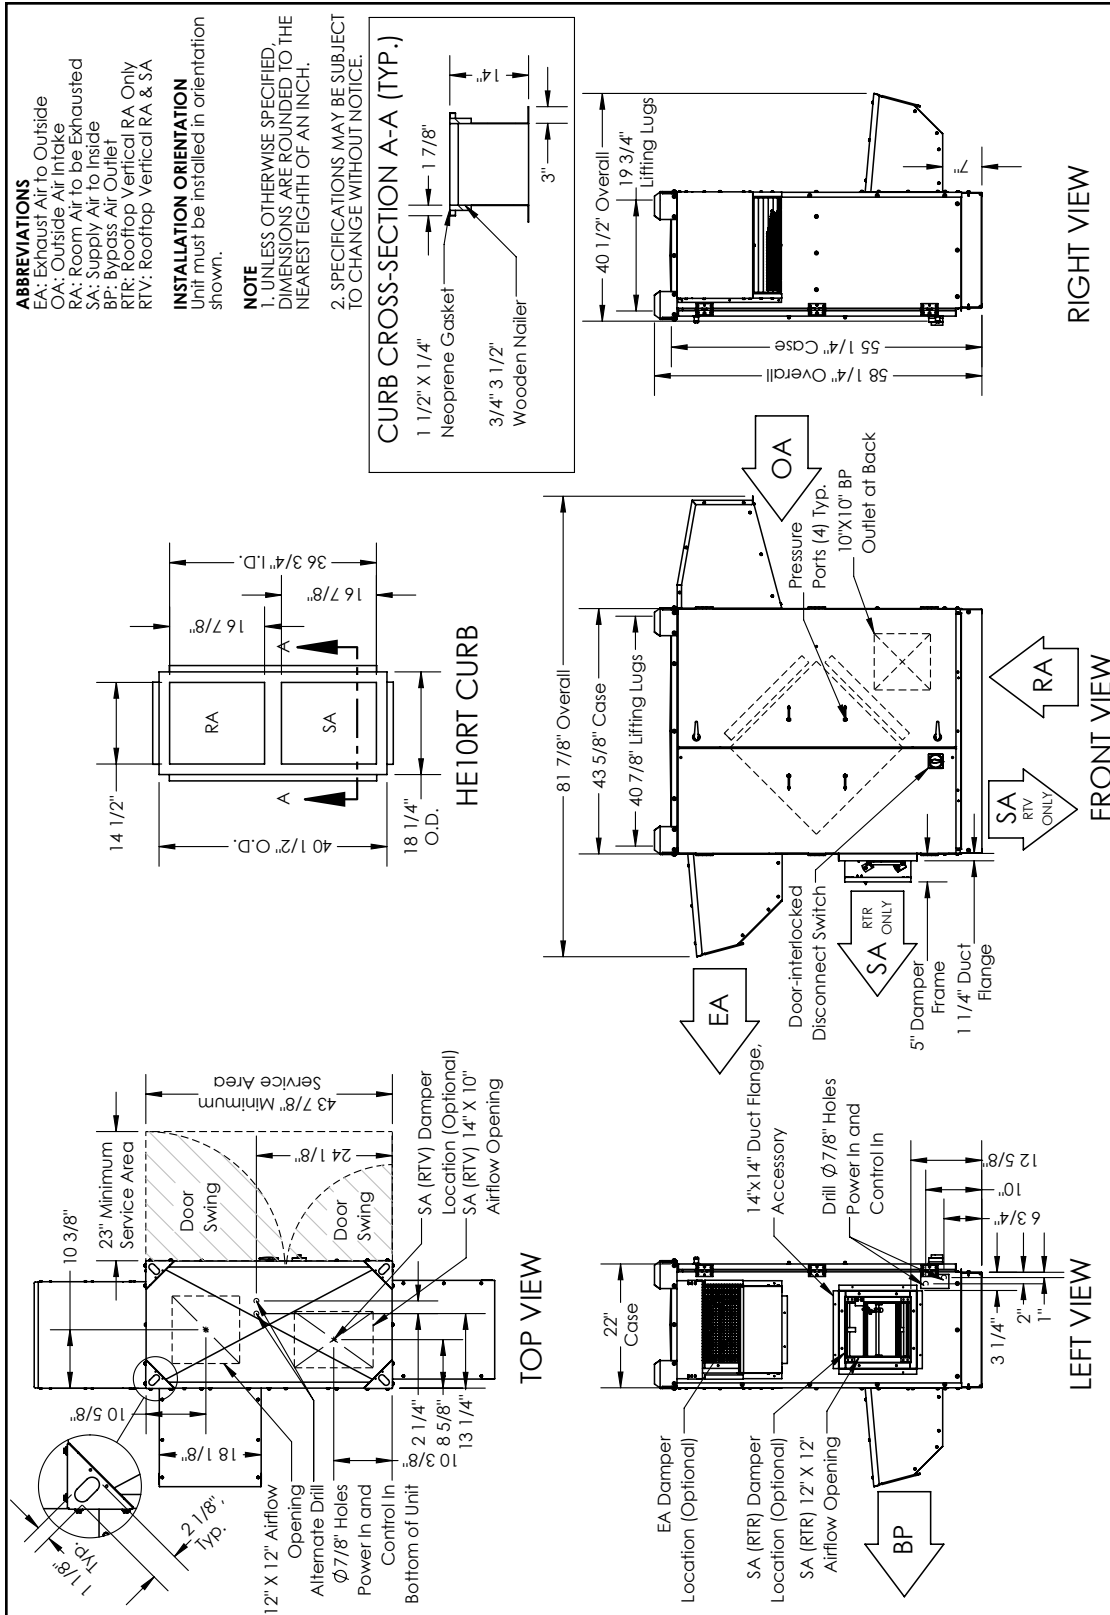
HE10TR-V DIMENSION DRAWING
